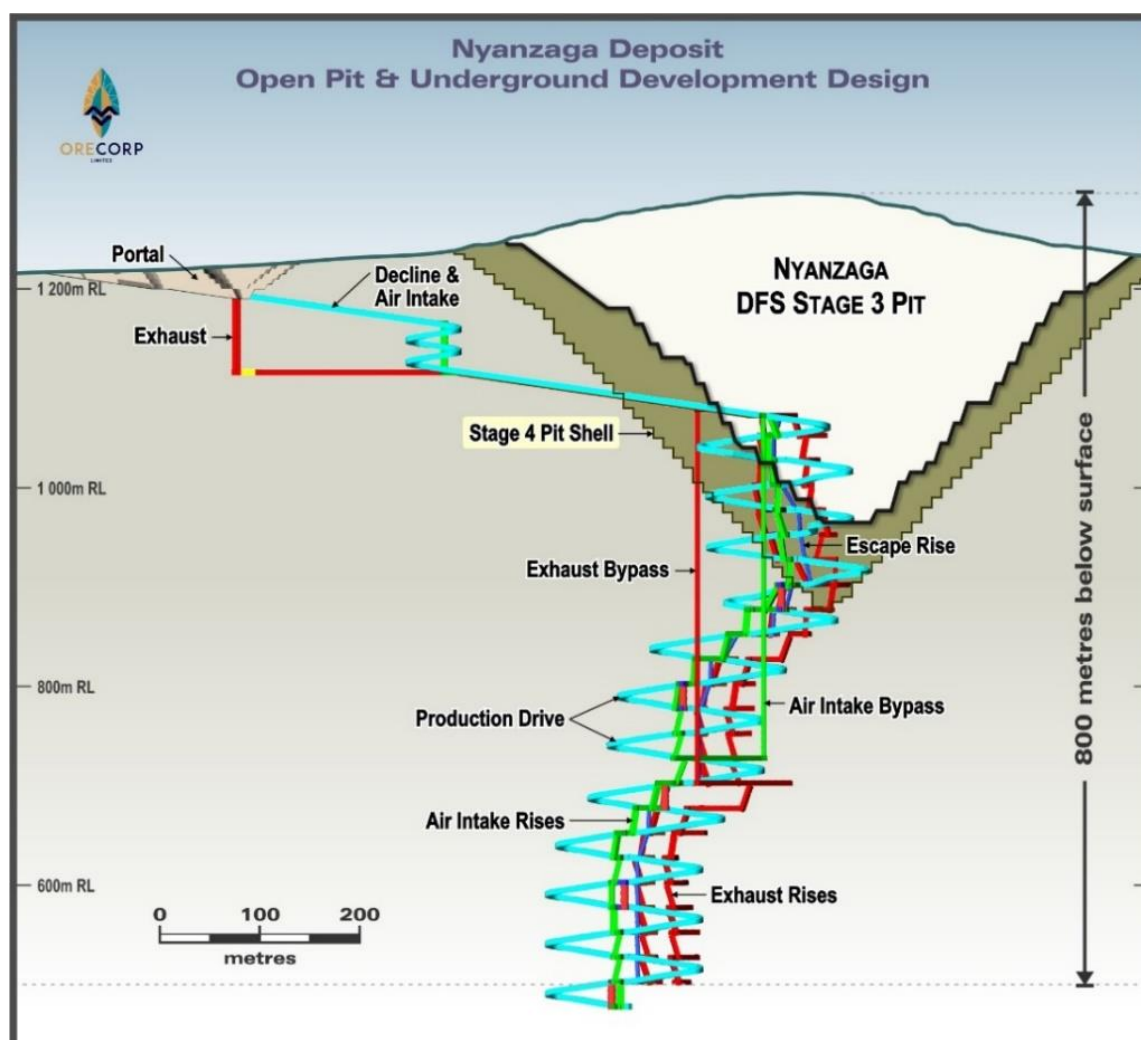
Nyanzaga Open Pit and Underground Development Design Showing the DFS Stage 3 Pit and the Stage 4 Pit Shell
